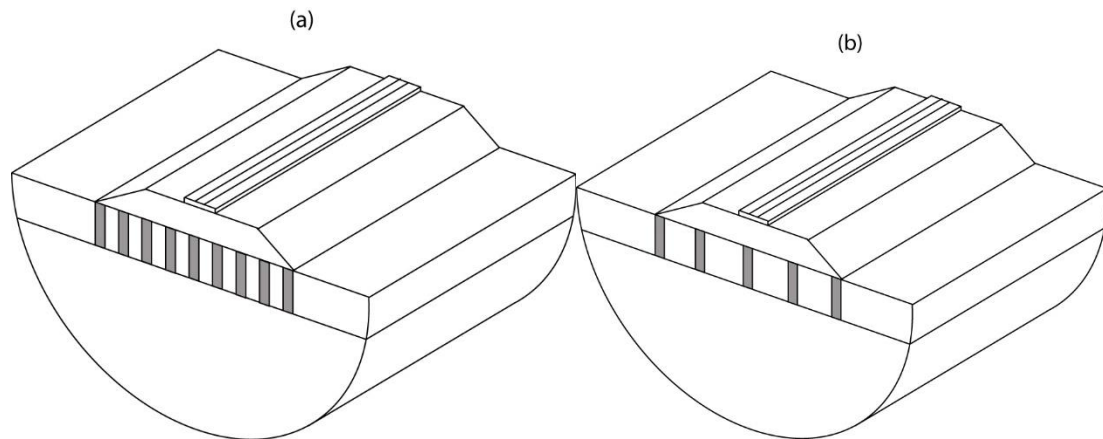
Discrete soil improvement: (a) Stone columns, (b) Jet grouting
